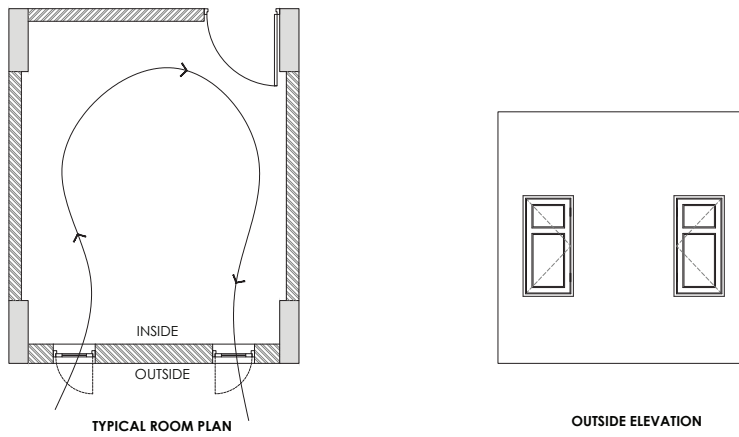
Openings on external wall and internal wall for cross ventilation (Guideline)
